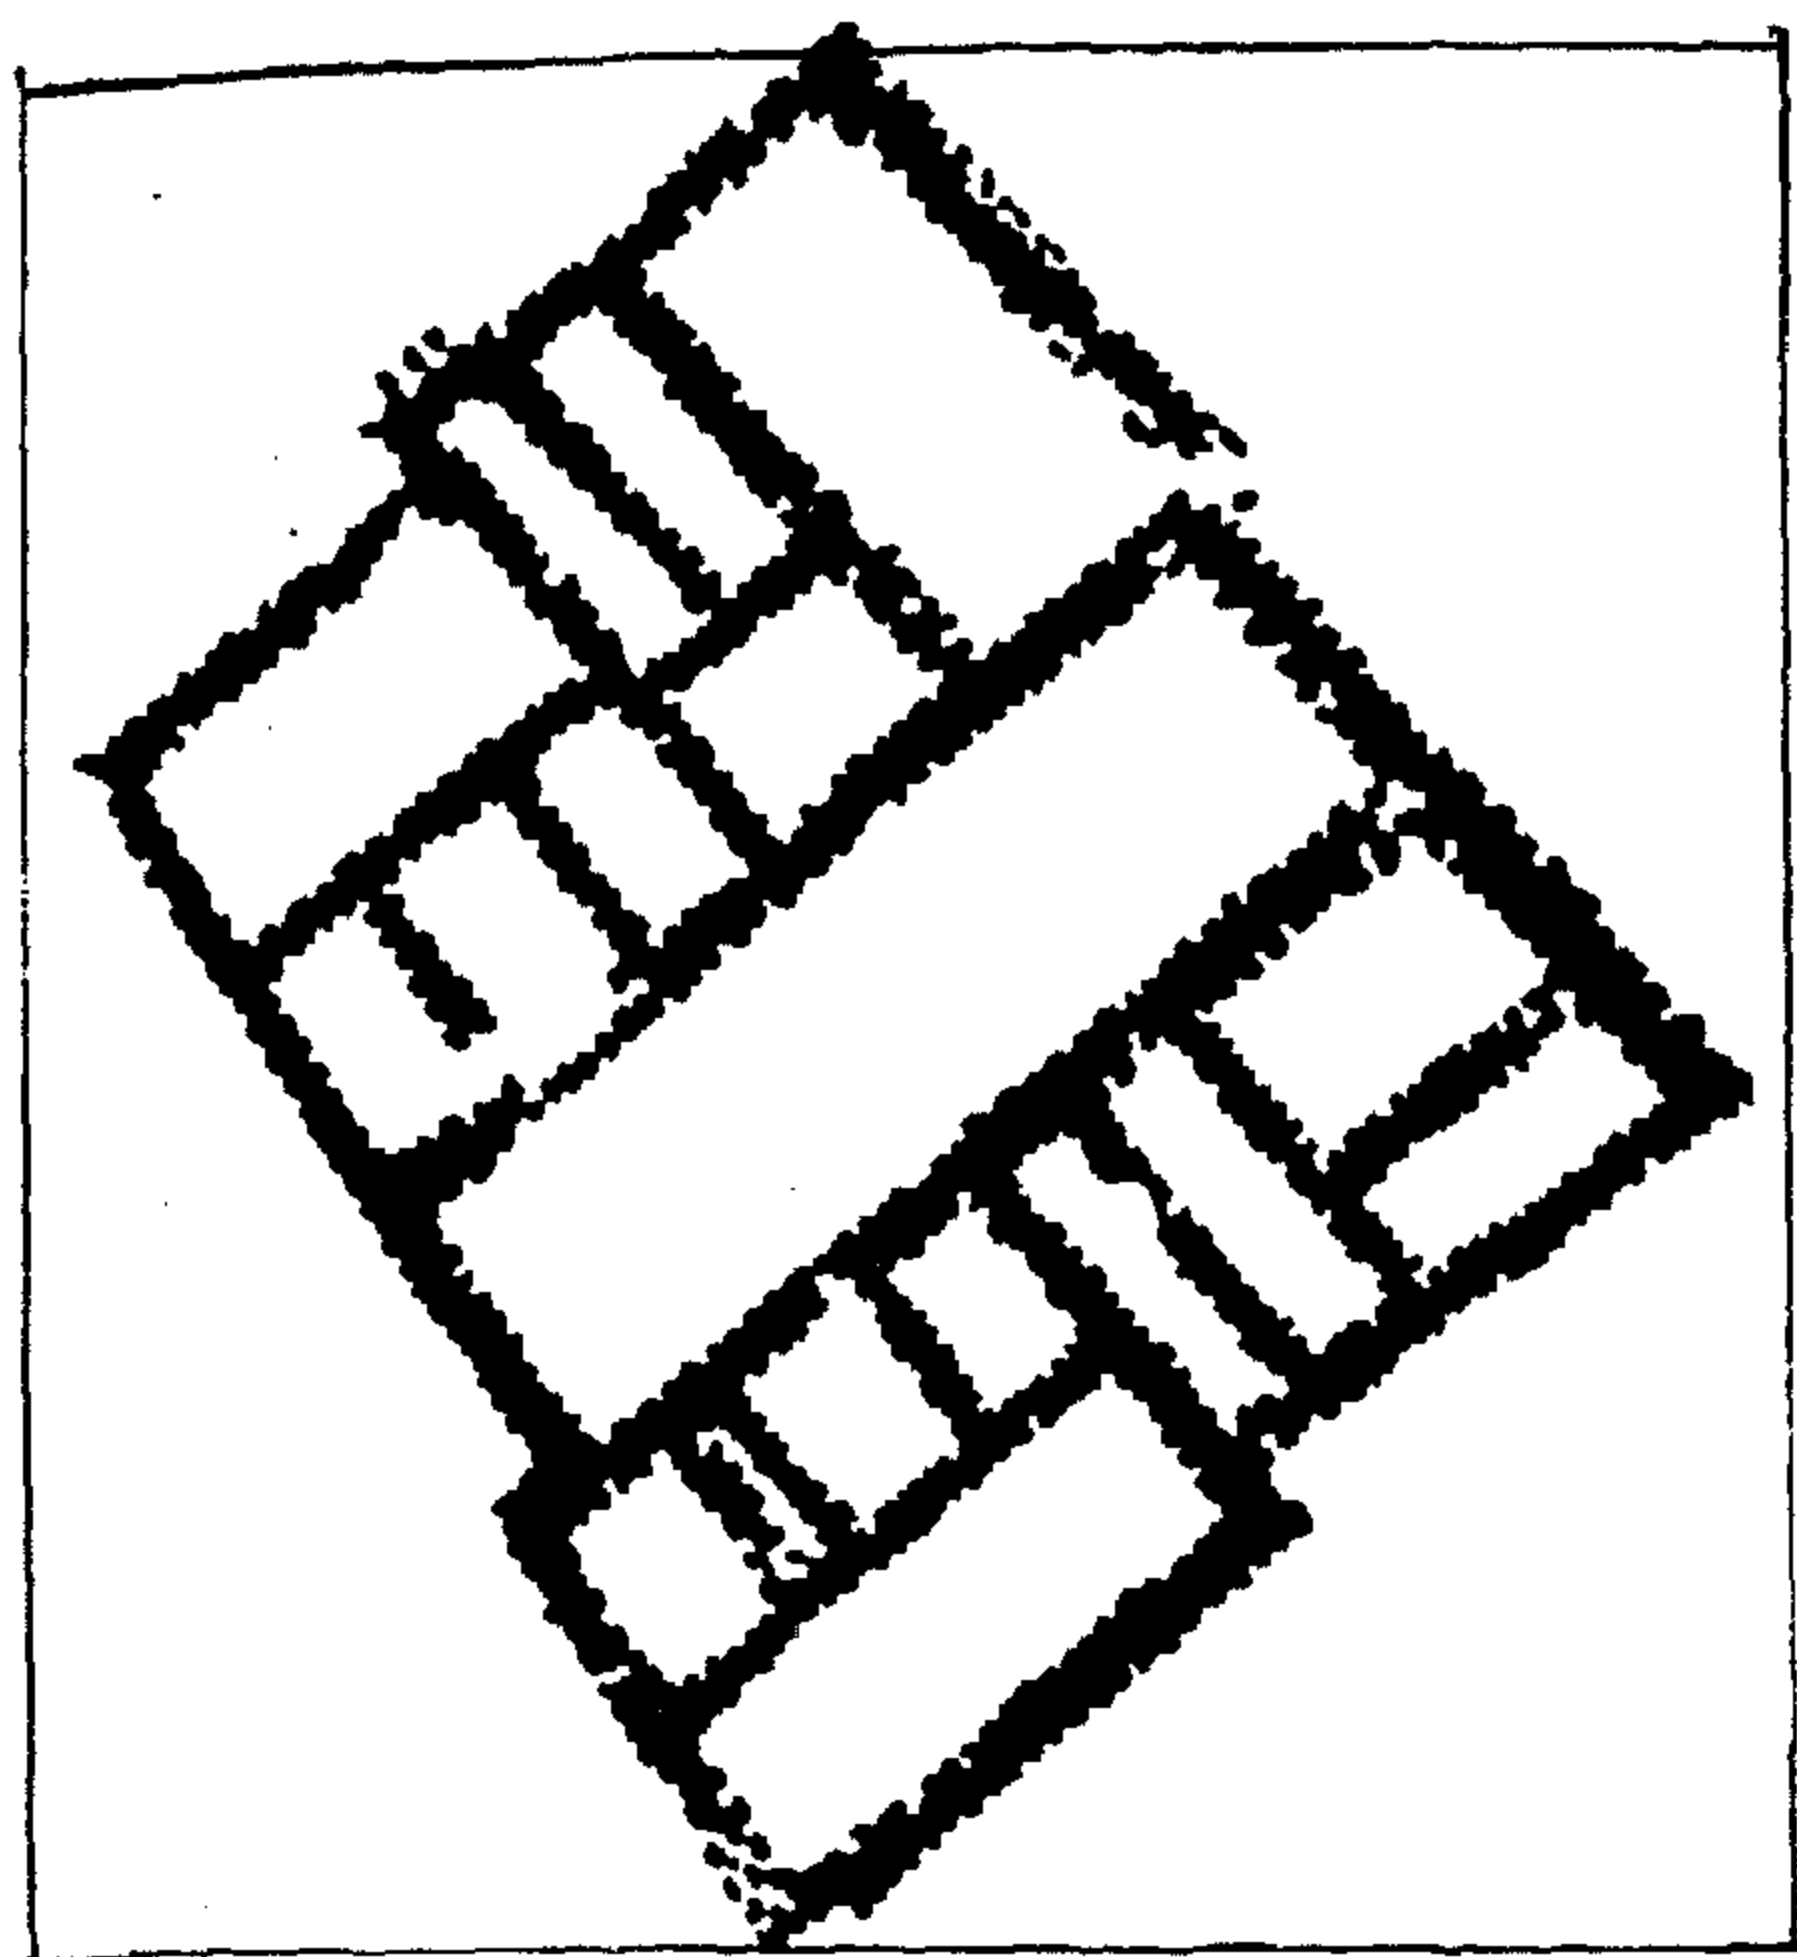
Plan of stone foundations of House in level XIV at Tepe Gawra (after Tobler 1950, pl. XIV).
